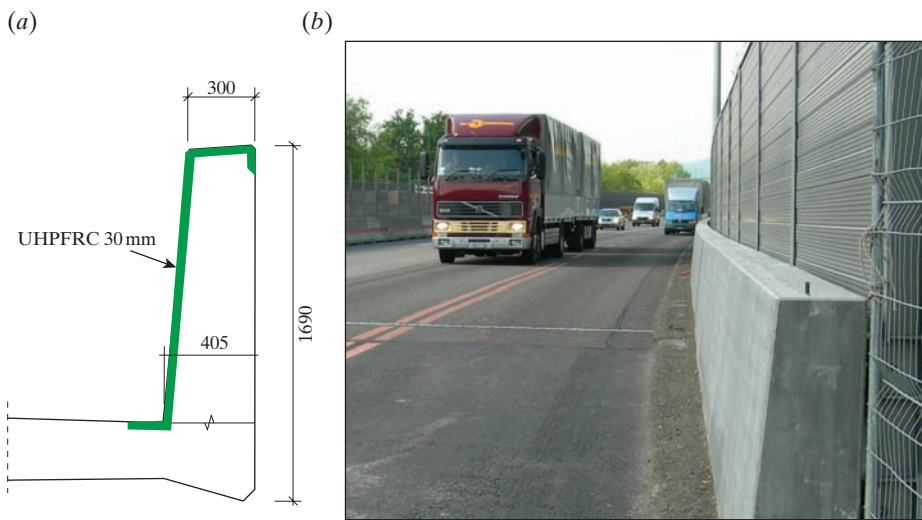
(a) Typical cross section of the crash barrier wall and (b) view after rehabilitation (Units: mm)
